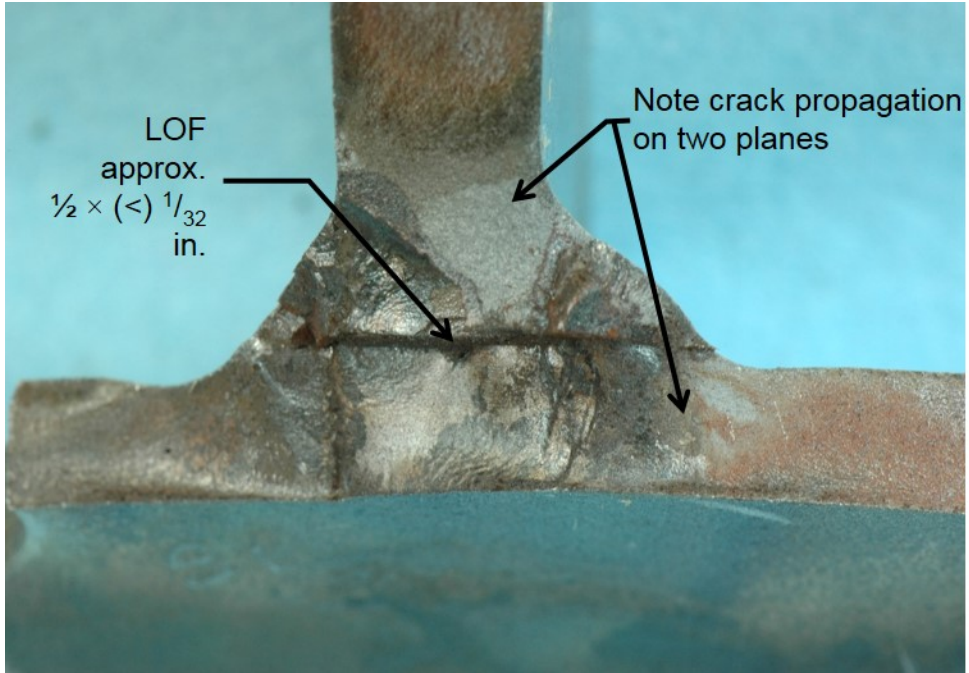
Fracture surface photographed perpendicular to the camera to clarify the LOF — crack to the south of rib
